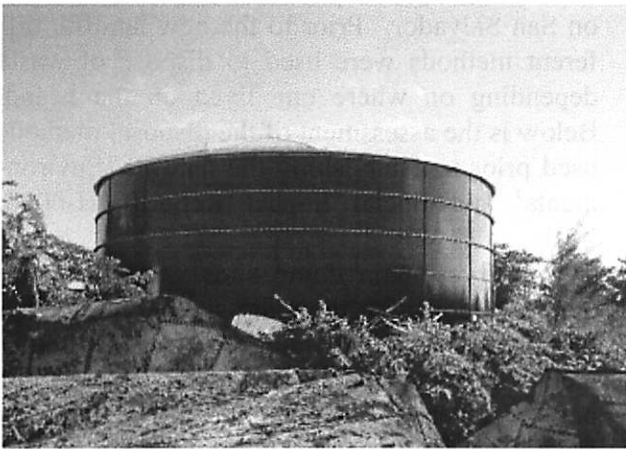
New water tank at Gerace Research Centre, constructed in 2006-2007.
